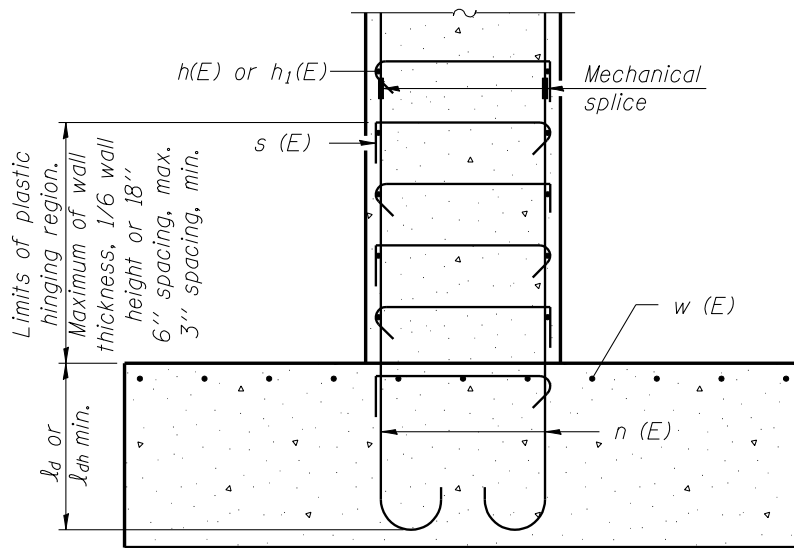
illustrates typical seismic detailing requirements which are applicable to solid wall, modified hammerhead, and hammerhead piers with footings. The focus of the figure is on the primary seismic critical location in and around the wall-footing interface (plastic hinging region). The theoretical plastic hinging region extends from the bottom of the wall to a distance that is at least equal to the thickness of the wall, one-sixth the height of the wall or 18 in., whichever is greater. Lateral reinforcement, in the form of cross ties (typically #3's or #4's) and horizontal perimeter reinforcement, shall be detailed in an arrangement that satisfies the criteria outlined for tied columns in Section 3.15.5.1. In addition, a single layer of cross ties shall be provided across the top layer of footing reinforcement at the same horizontal spacing used for the plastic hinging region of the stem.
